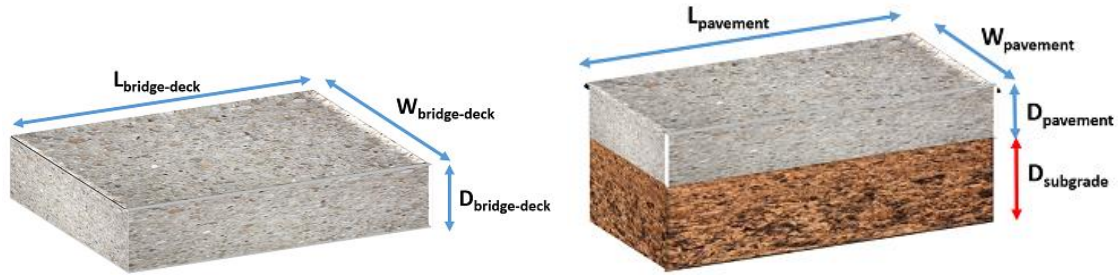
Member geometries available in MATRICES version 1.0 (a) Bridge Deck (b) Pavement
